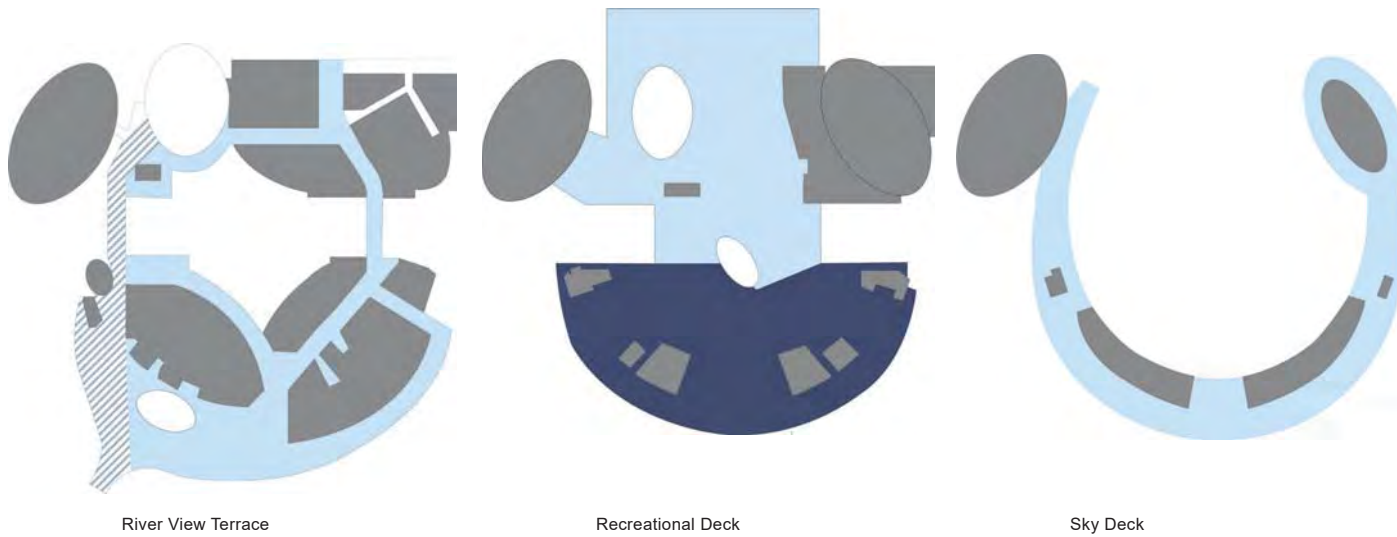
Indicative Public/Private Open Space Plan (not to scale, built form indicative only)
